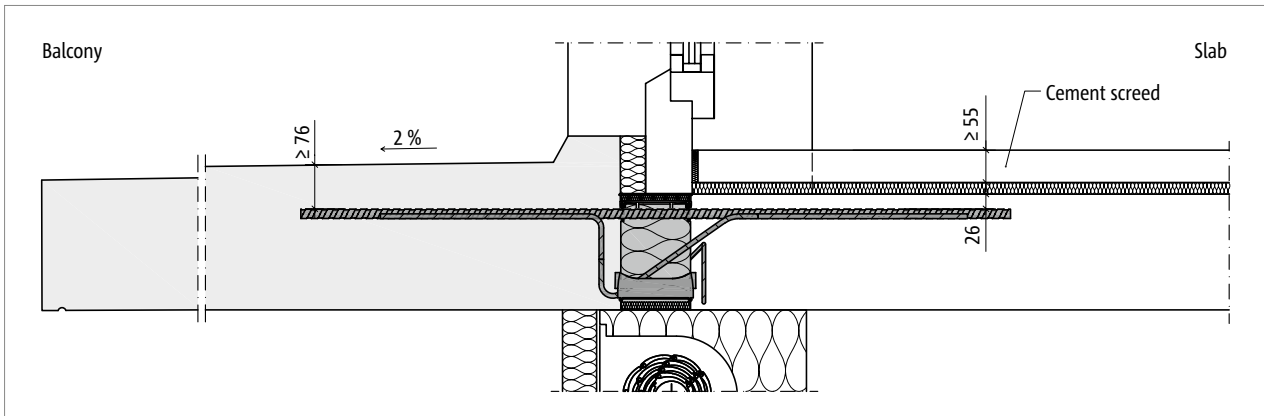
Schöck Isokorb® CXT type K-E-REI120: Precast unit with higher concrete cover and flooring material inside for fire protection class REI 120
